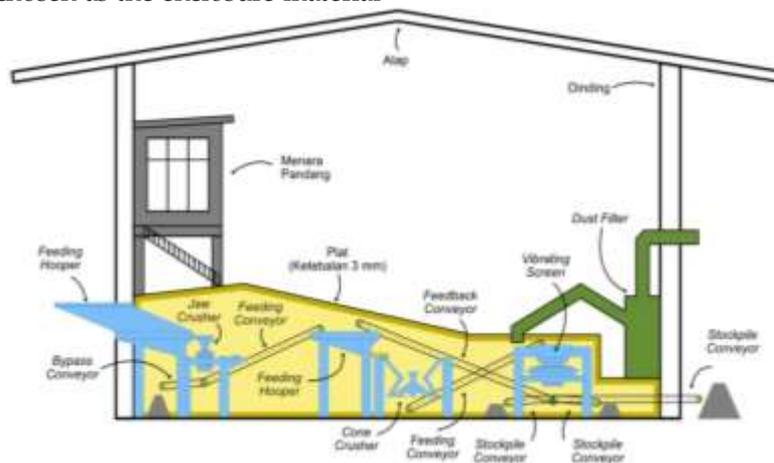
Stone Crusher Machine Cover Design Using Iron Plate.
